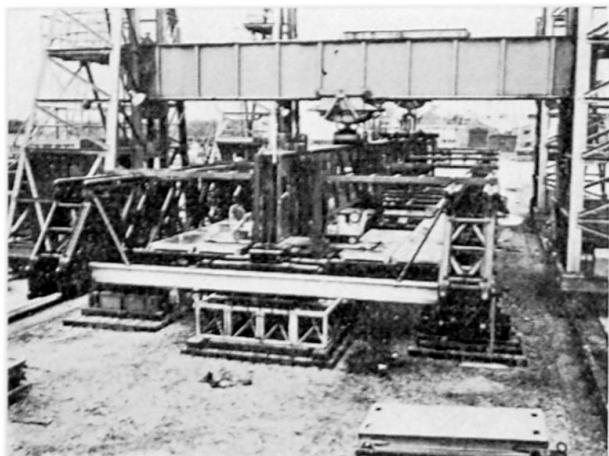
2nd Full Scale Test. View of test rig and test girder.
